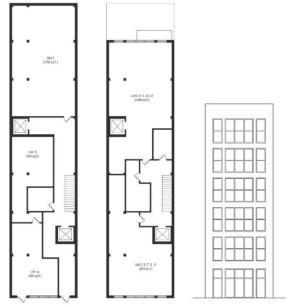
, 608, 609 (left to right) Building 20, first (ground) floor (1916); floors 2–6 (1916); (right) street-front elevation (1978). I" = 32'. For plans, north is right.
